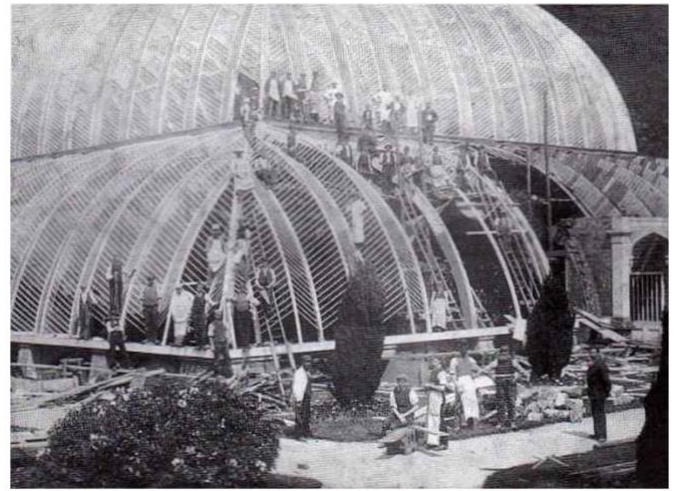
Construction under way on the Great Conservatory at Chatsworth. Paxton developed Loudon's ridge-and-furrow approach as shown by the zigzag glazing bars.
